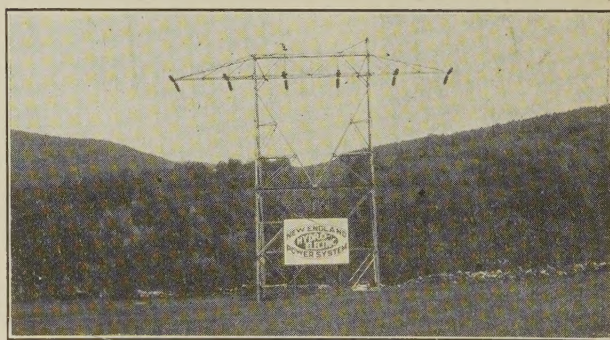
TOWER ON HARRIMAN-MILLBURY 110-KV. LINE
